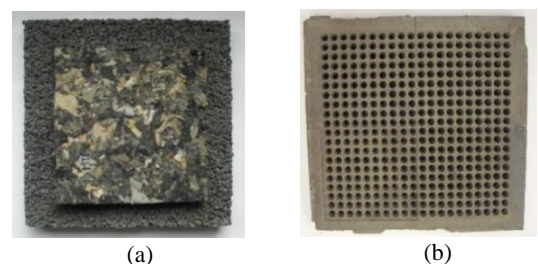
A pervious concrete panel M38_1 (a), and a perforated concrete panel B06 from its reverse side (b).
